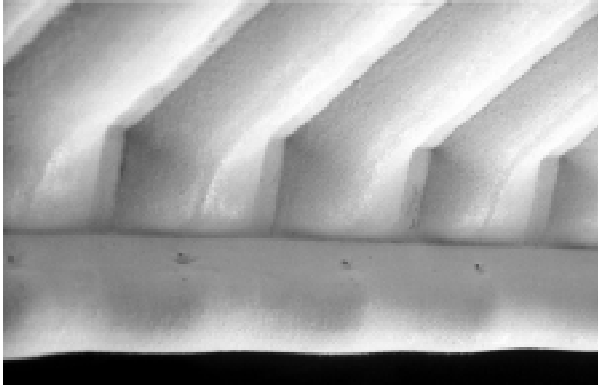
Model showing ribbed slab and its supporting beam formed from a single flat sheet of fabric.
